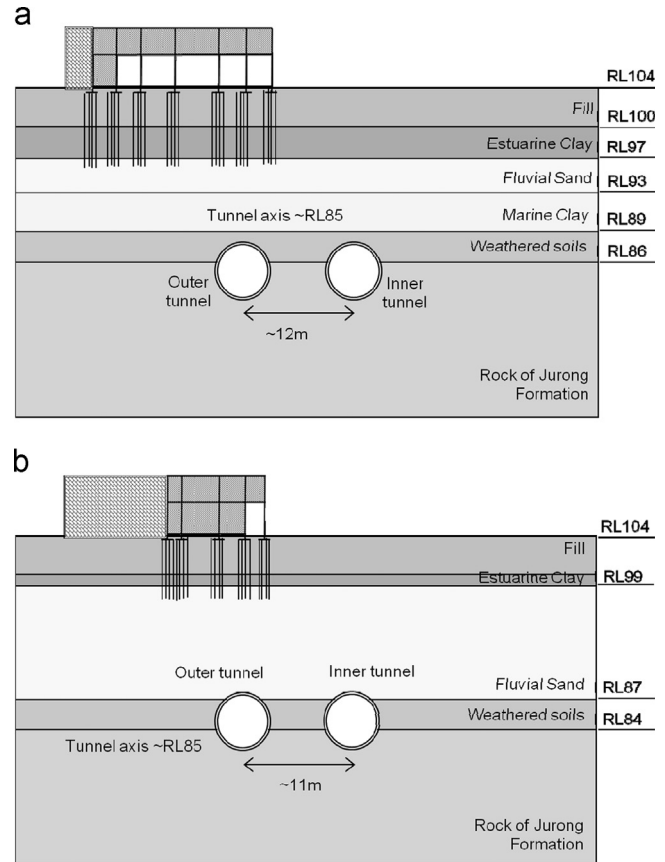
Cross-sections of the shop houses and soil profiles (a) Near west end of shop house A29 and (b) Near west end of shop house A32.
